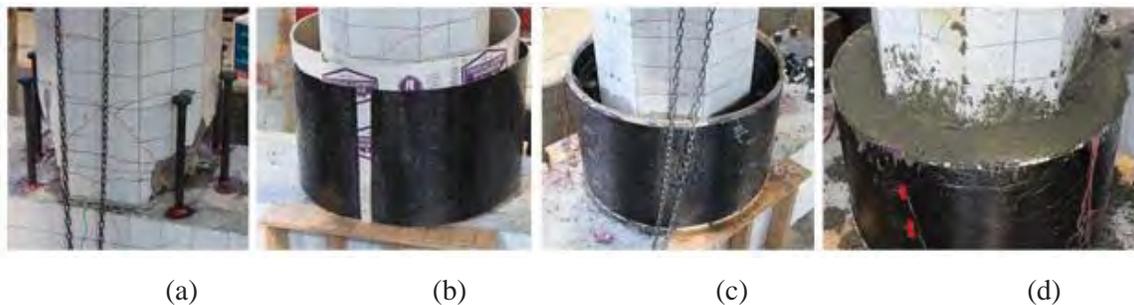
Repair procedure: (a) post installed headed bars; (b) split CFRP shell; (c) CFRP shell around column; (d) CFRP shell filled with nonshrink or expansive concrete.
